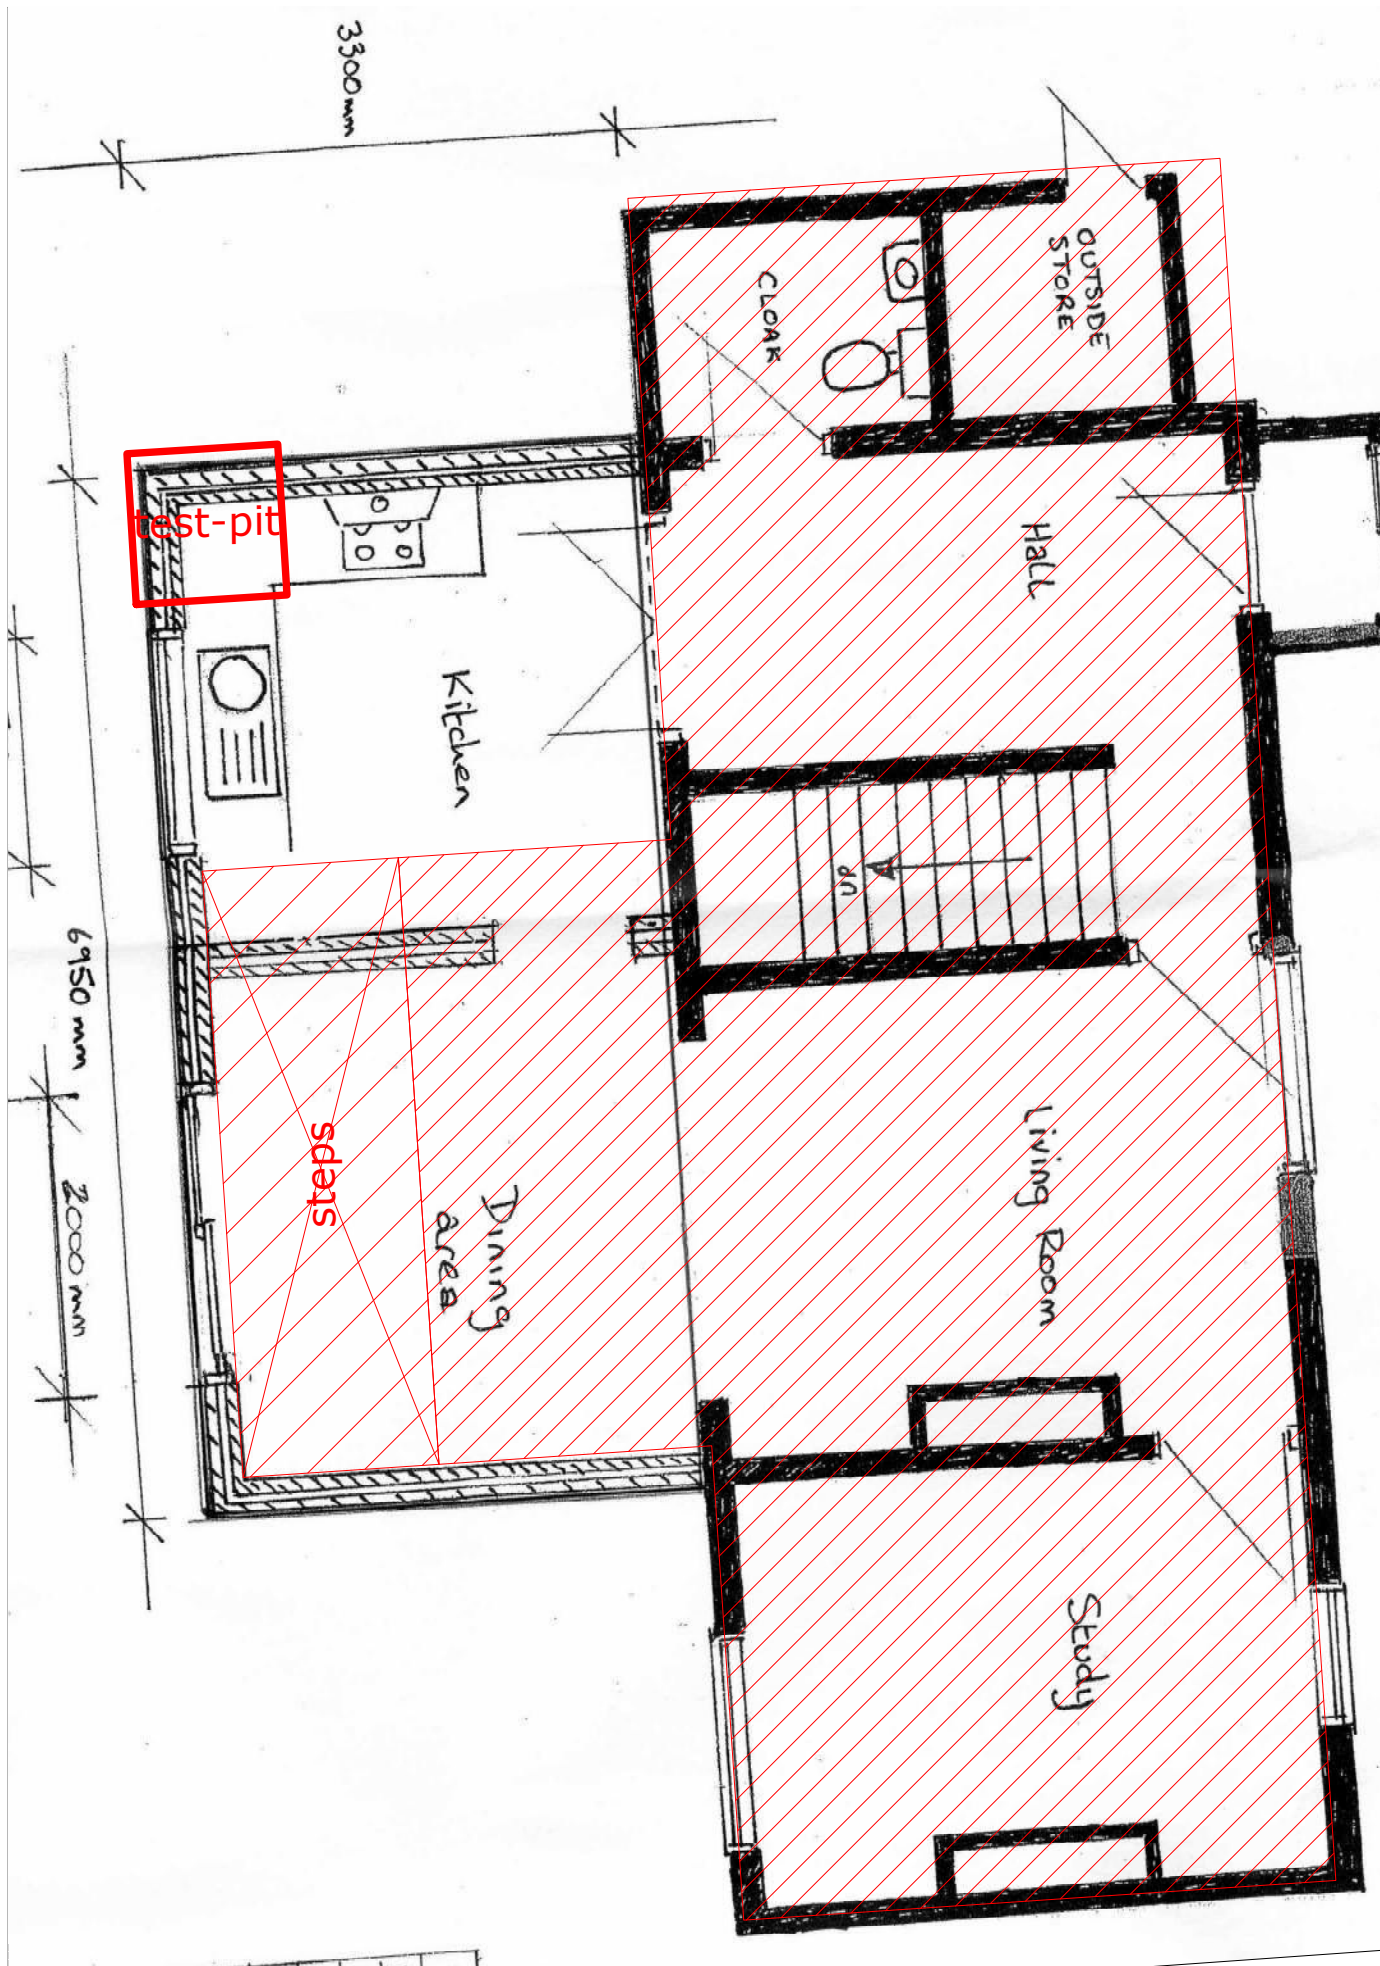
Plan showing detail of existing building traced to scale from Land Registry map with external steps added from inspection on site (red hatch), and client's map of new extension (black image), with location of proposed test-pit
